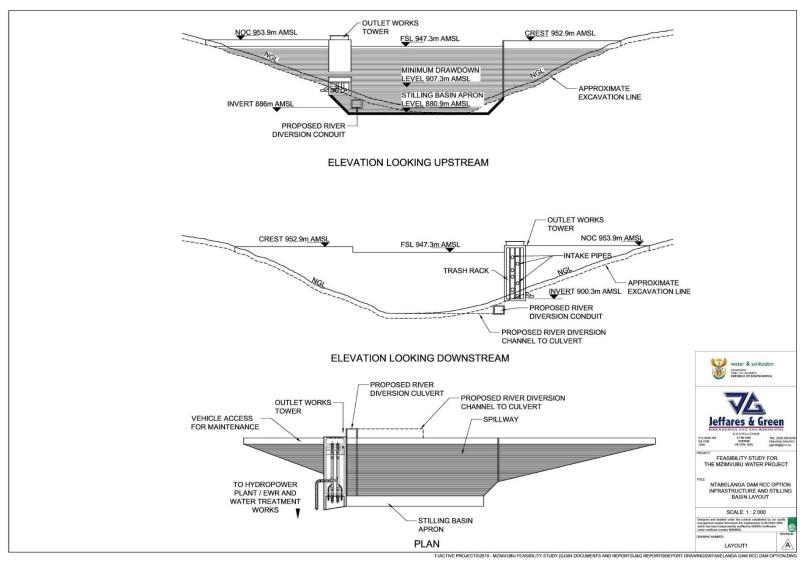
RCC Dam Embankment Plan and Longitudinal Elevations
